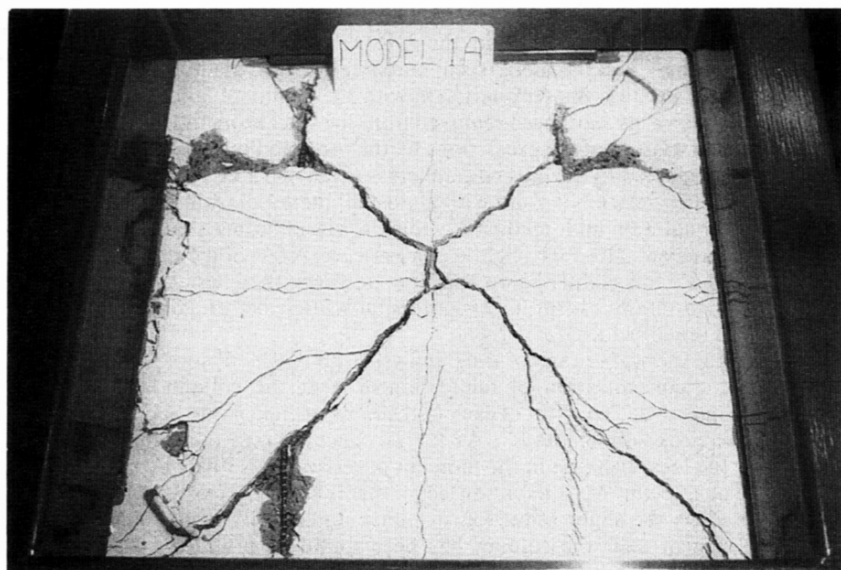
Flexural punching failure of lightly reinforced slab-column specimen ($\rho = 0.44\%$)
